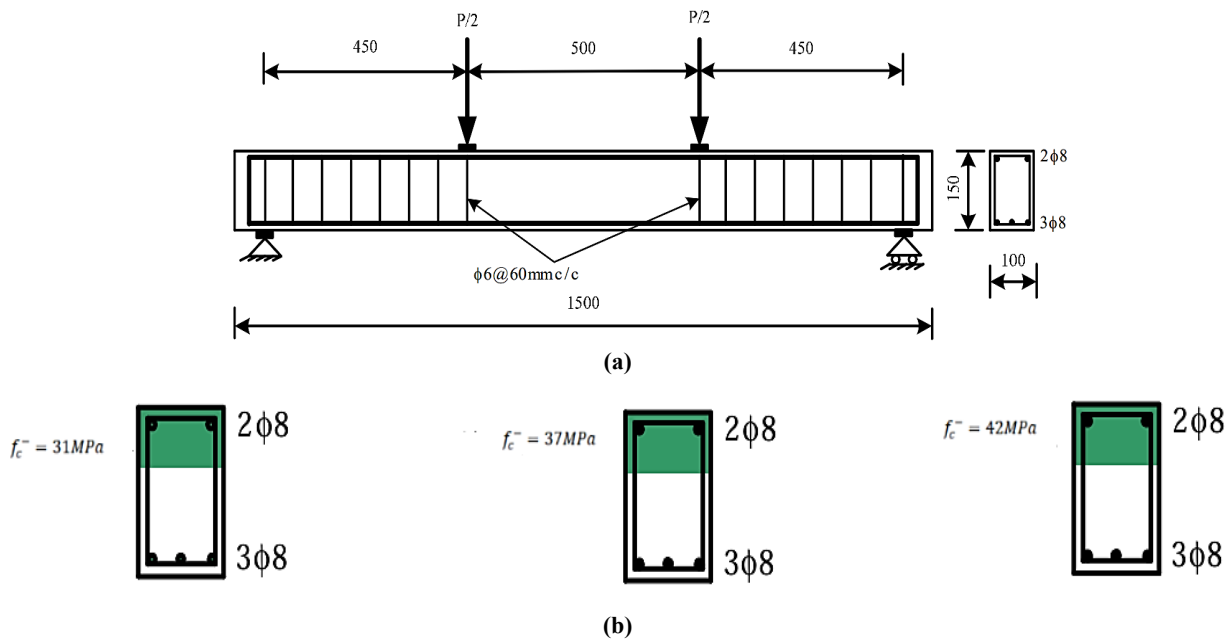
Details of the tested beams (all dimensions are in mm): (a) Beam profile (b) Beam sections [12]
